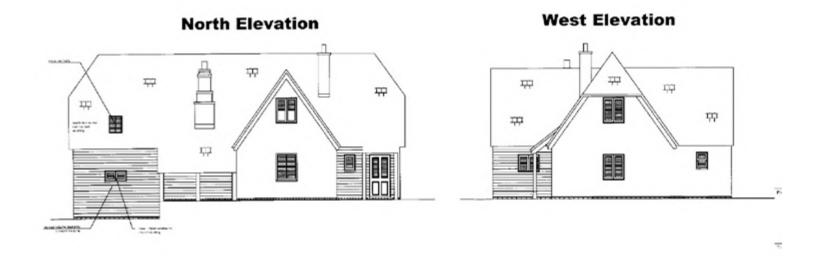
Folly Cottage Elevations showing new extension with timber weatherboarding
